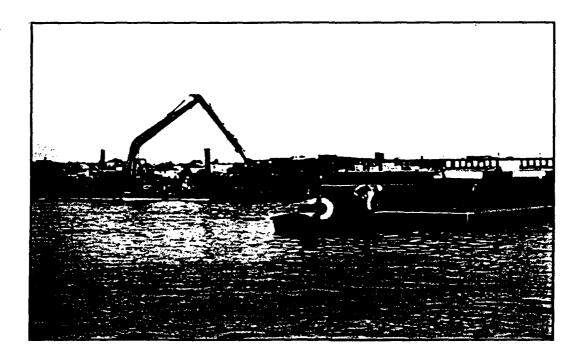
Photographs of Dredging Material Transfer to Sawyer Street Facility
